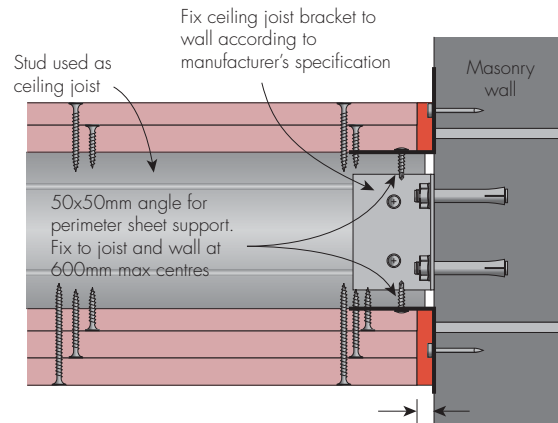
Non-Trafficable Ceiling to Masonry Wall
